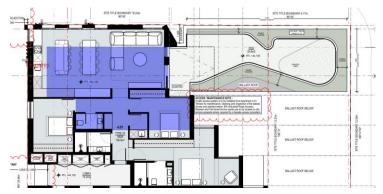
Excerpt of the floor plan for apartment 4.01- Council Officers have overlayed the potential area for the open living and kitchen in purple
